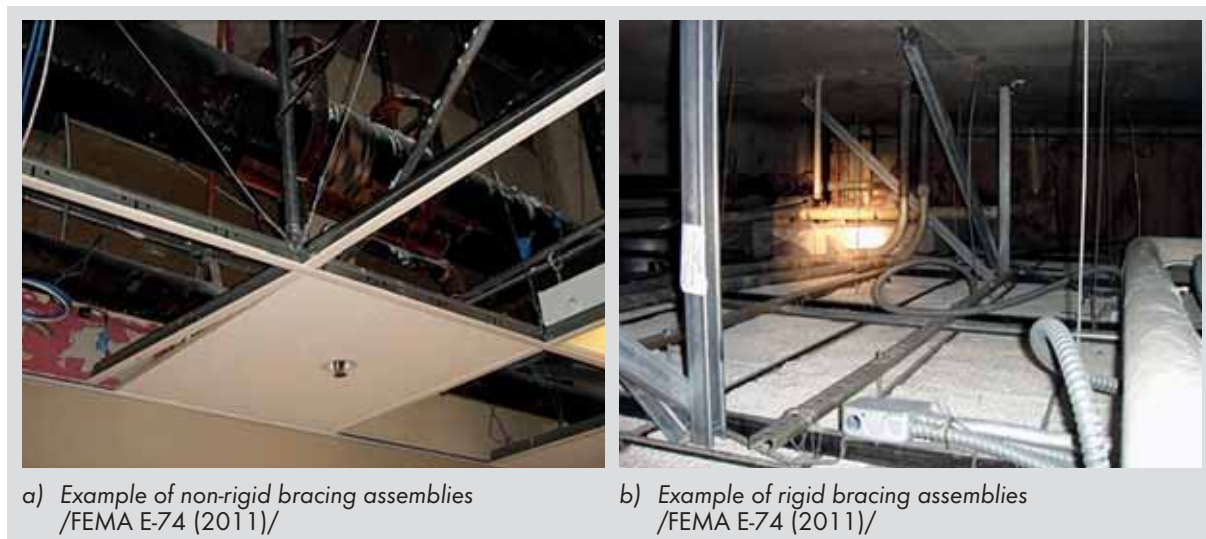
Seismic bracings for suspended acoustic lay-in tile ceilings
